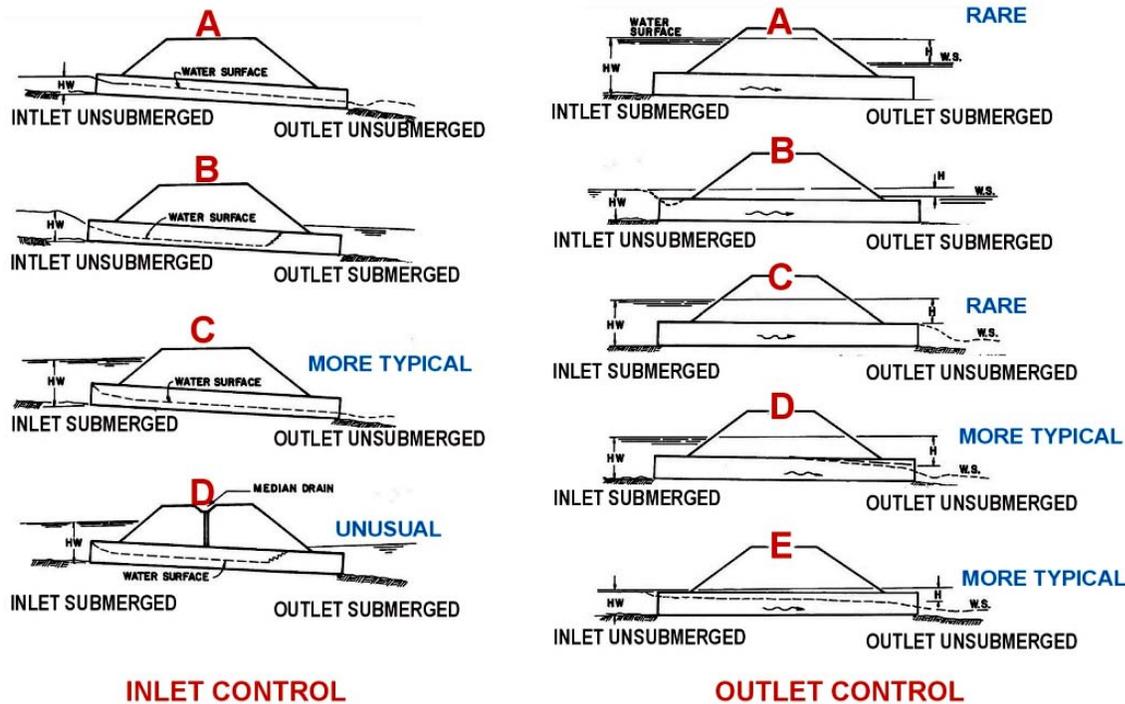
Some examples of flow conditions in culverts operating under inlet control and outlet control (Redrawn from Norman et al. 2005)
